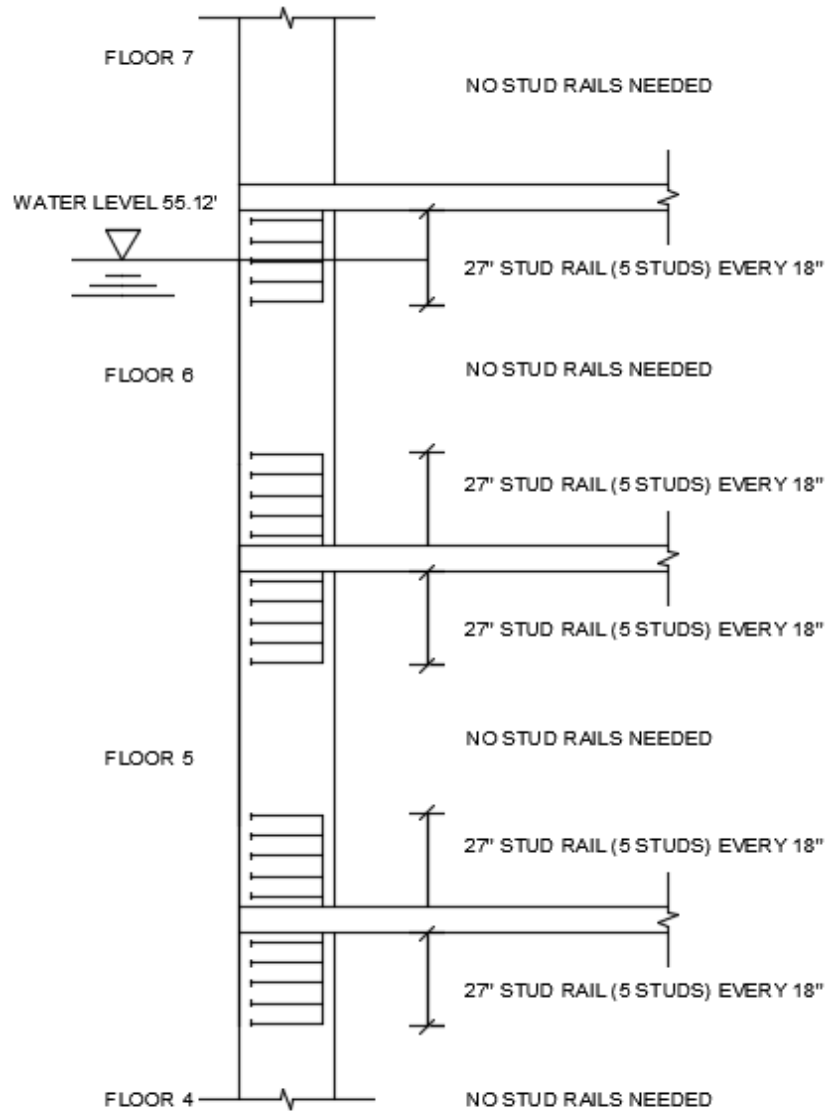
Stud Rail Diagram for the Floor 4 – 7
